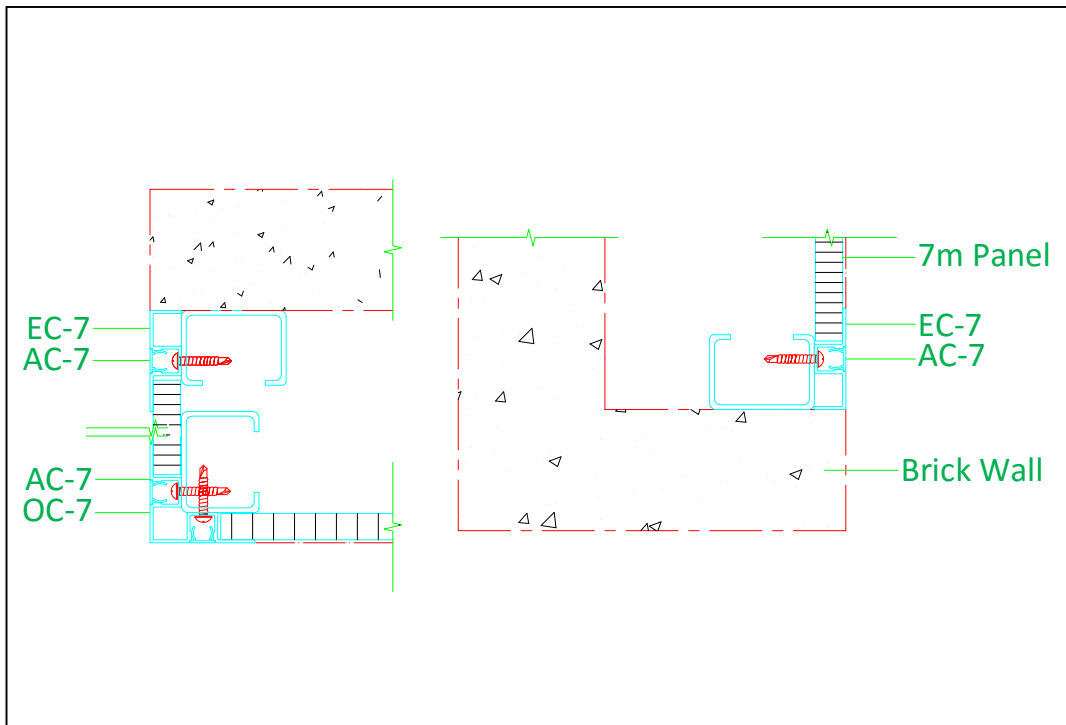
SCL2000 Finish Assemble Simulation Outlook Drawing
